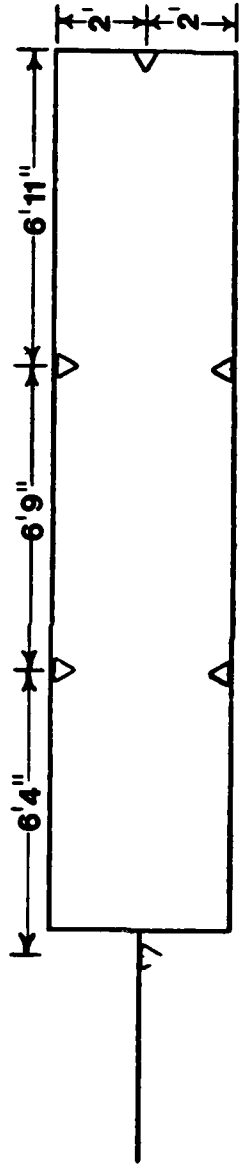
AFFF Sprinkler System Piping and Head Arrangement Configuration A - Tests 1,2,3
